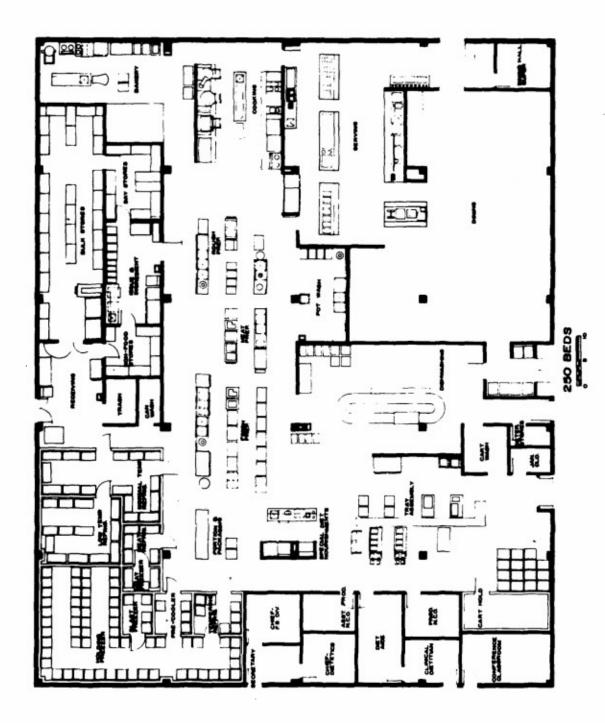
Kitchen and Dining Hall Layout - 250-Bed
